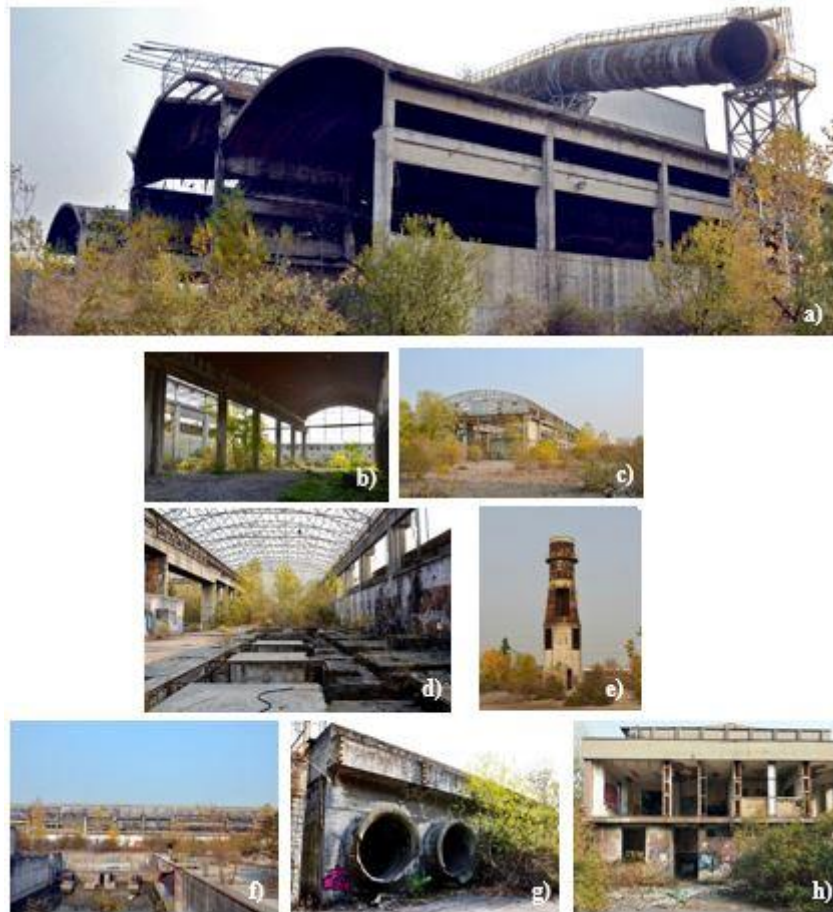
a) exterior and b) interior building A; c) exterior and d) interior building B, e) steel chimney; f) exterior water tanks, g) large concrete pipes, h) office building
